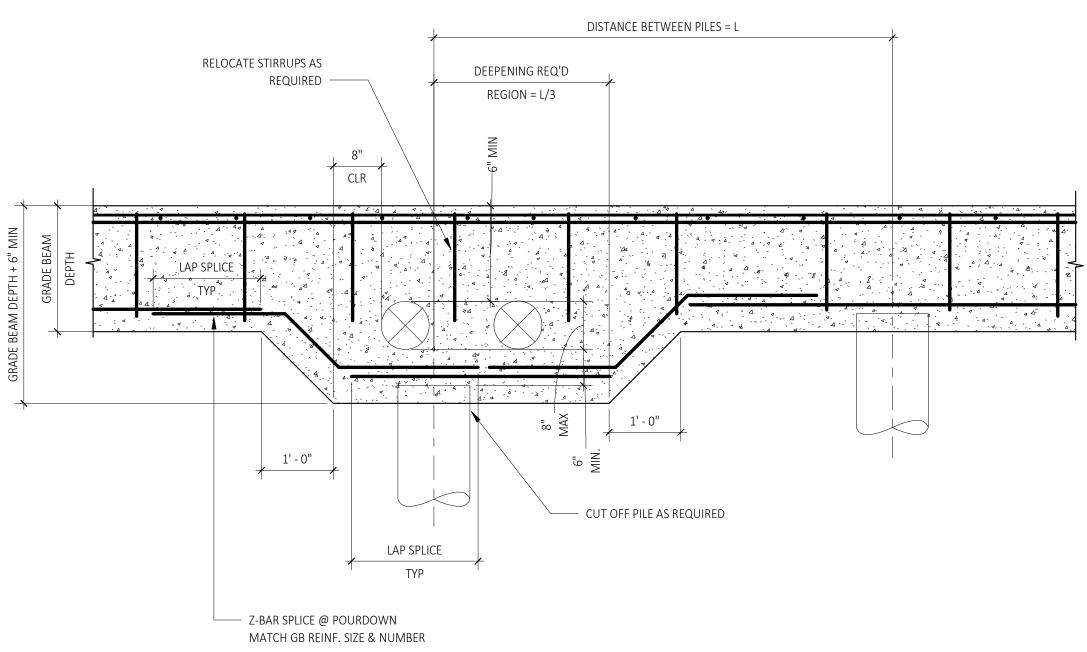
DETAIL SHOWS MINIMUM REQUIREMENTS FOR PIPE PENETRATIONS THAT DO NOT REQUIRE REINFORCEMENT. MAXIMUM (2) PENETRATIONS IN A GROUP. ANY GROUP LARGER THAN (2) SHALL BE BROUGHT TO THE ATTENTION OF THE EOR. NO HORIZONTAL PENETRATIONS SHALL BE ALLOWED IN THE SLAB. SEE TYPICAL DETAIL FOR VERTICAL PIPE PENETRATIONS FOR ADDITIONAL REQUIREMENTS.
